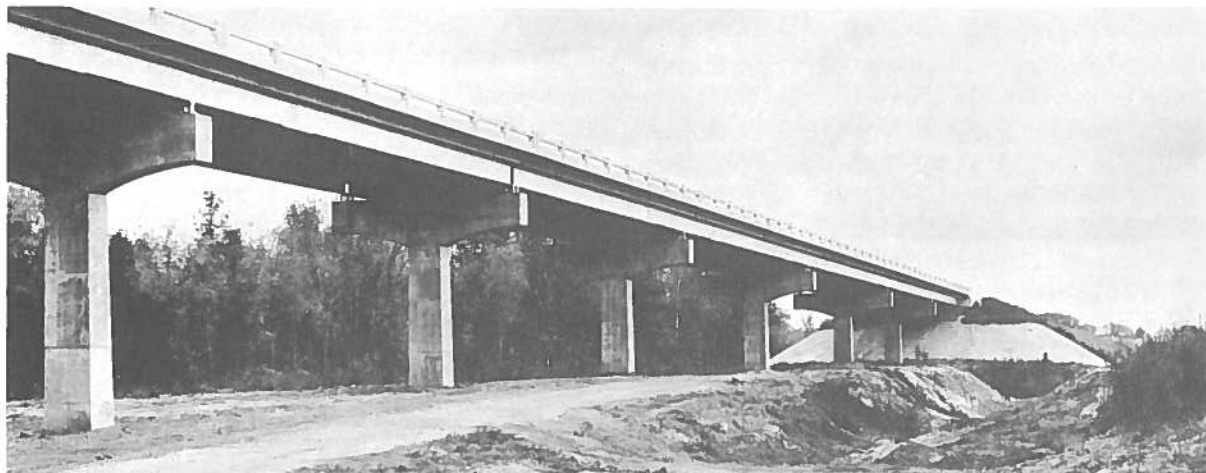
CONTINUOUS COMPOSITE ROLLED BEAM SPANS, GEORGIA
